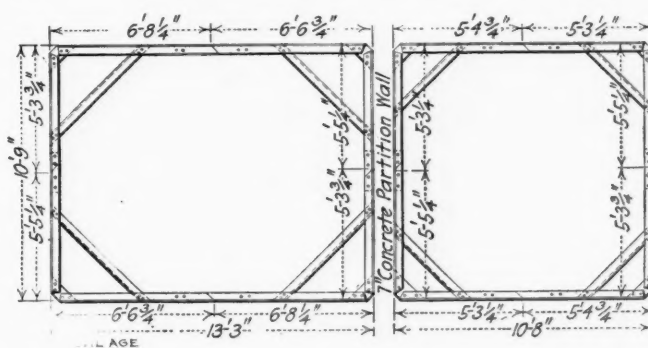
STEEL FRAME USED IN FORMS FOR AUXILIARY SHAFT
